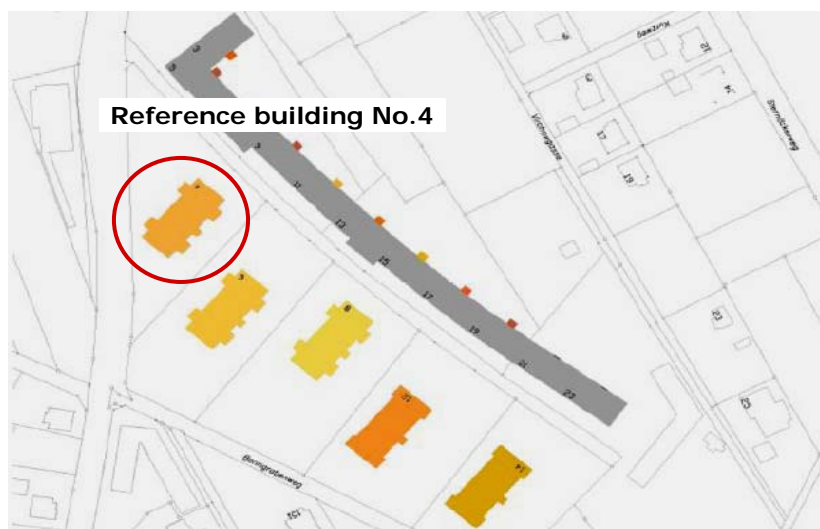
Site plan of the entire area and the specific position of the building "Dieselweg No. 4" (Source: Hohensinn ZT GmbH)
